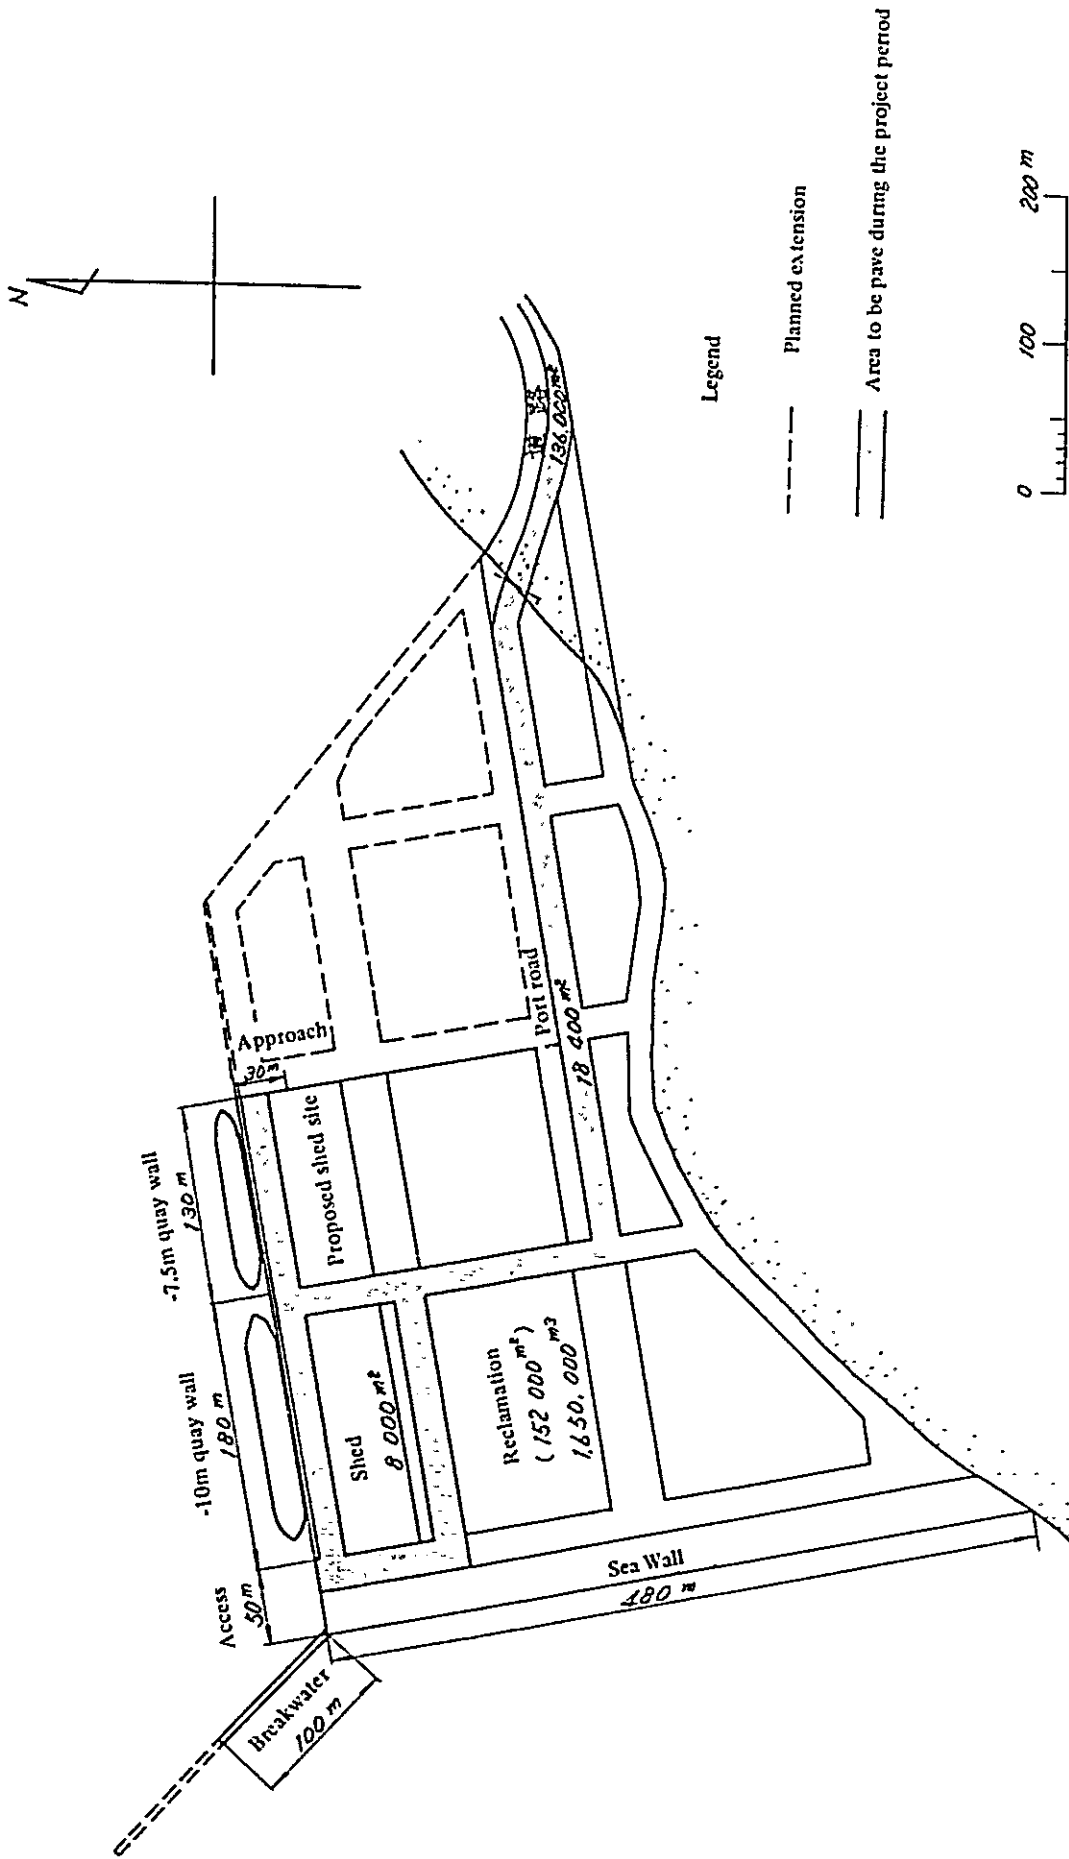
Ground Plan-for the Construction of 2 berths at South Caldera
